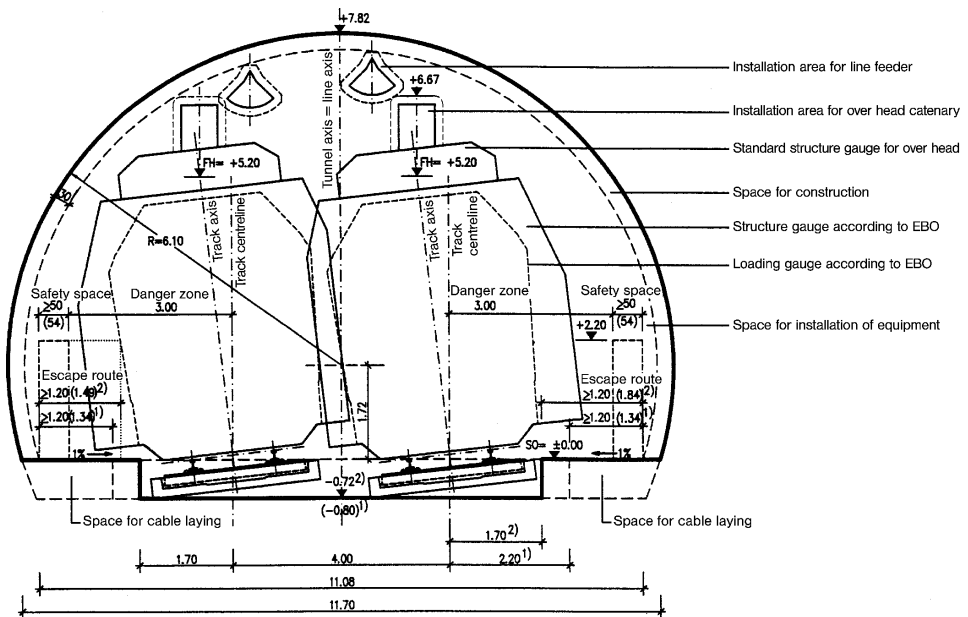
Guideline detail for a two-track express tunnel with circular section according to Ril 853.
